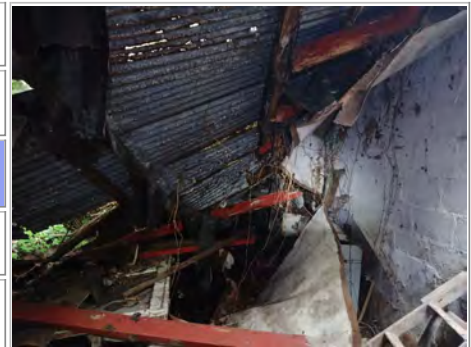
Restricted access to area surrounding the property, thick undergrowth to north, east and west - access made through roof at south wall
